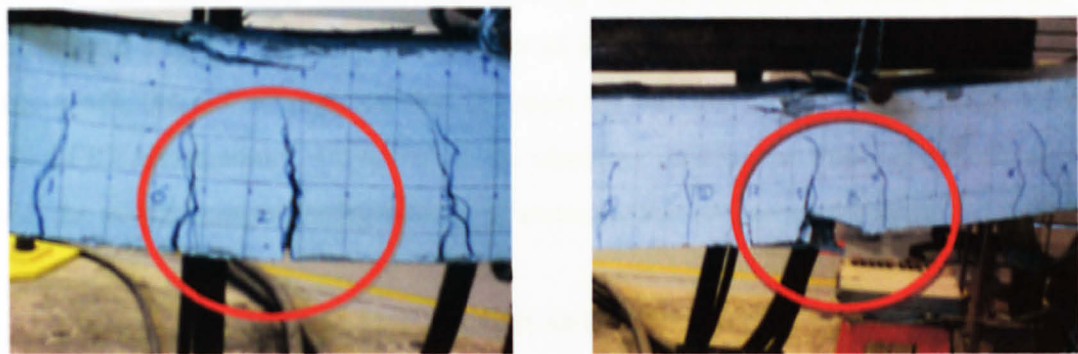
, the figures show the size of crack between control beam (left) and the strengthening CFRP beam.
